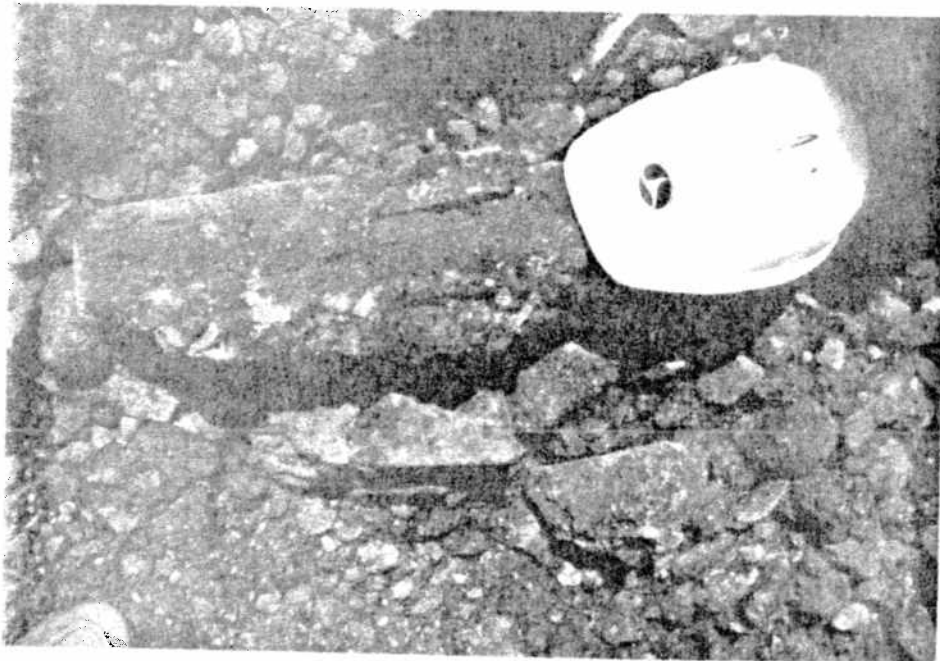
Existing Pavement After Ripping and Some Crushing
